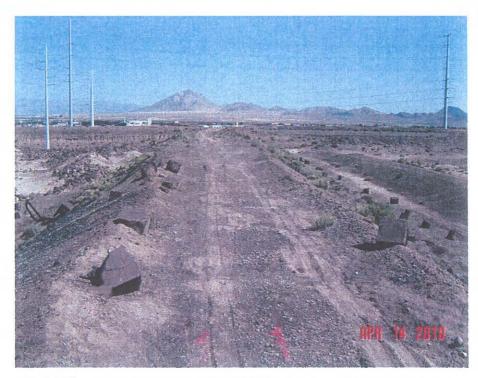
West side debris pipe. View looking north at midpoint on hill.
